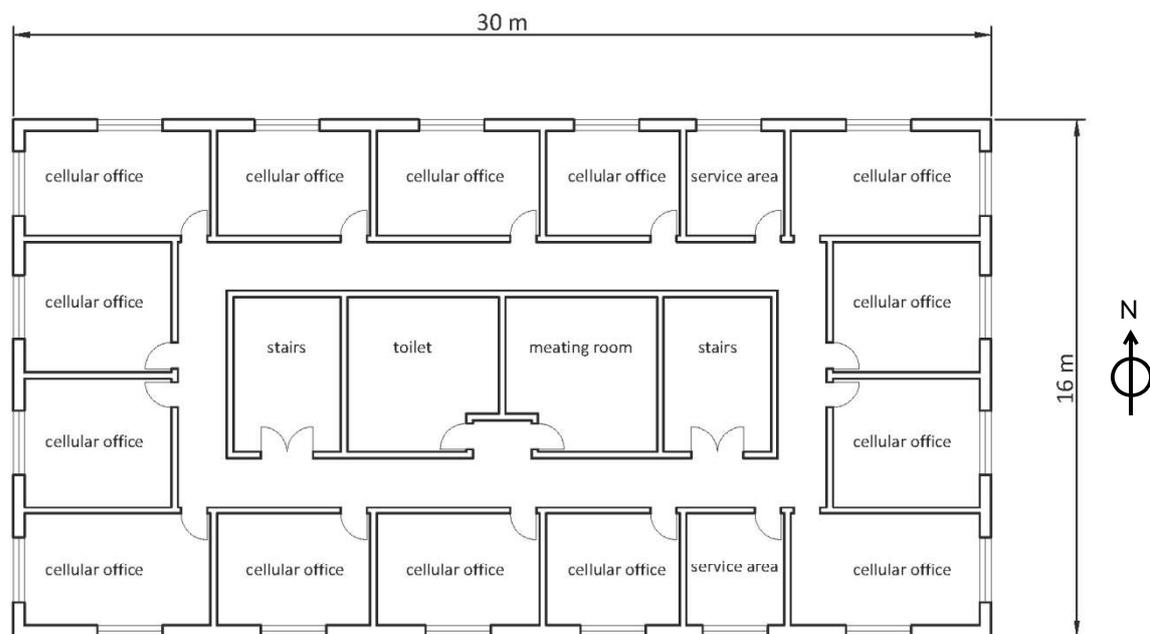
Plan view of the typical floor of Building B1, B2 and B3.
